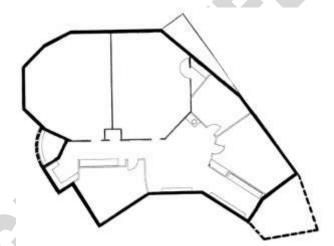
The original floor plan of the building, including seminar rooms and entrance lobby
